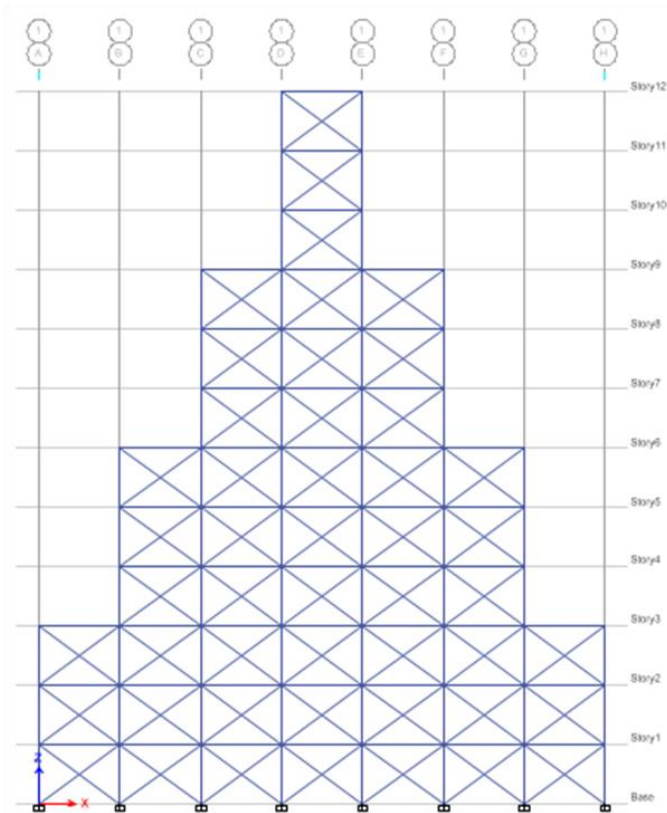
Elevation of vertical geometric irregular building with masonry infill
